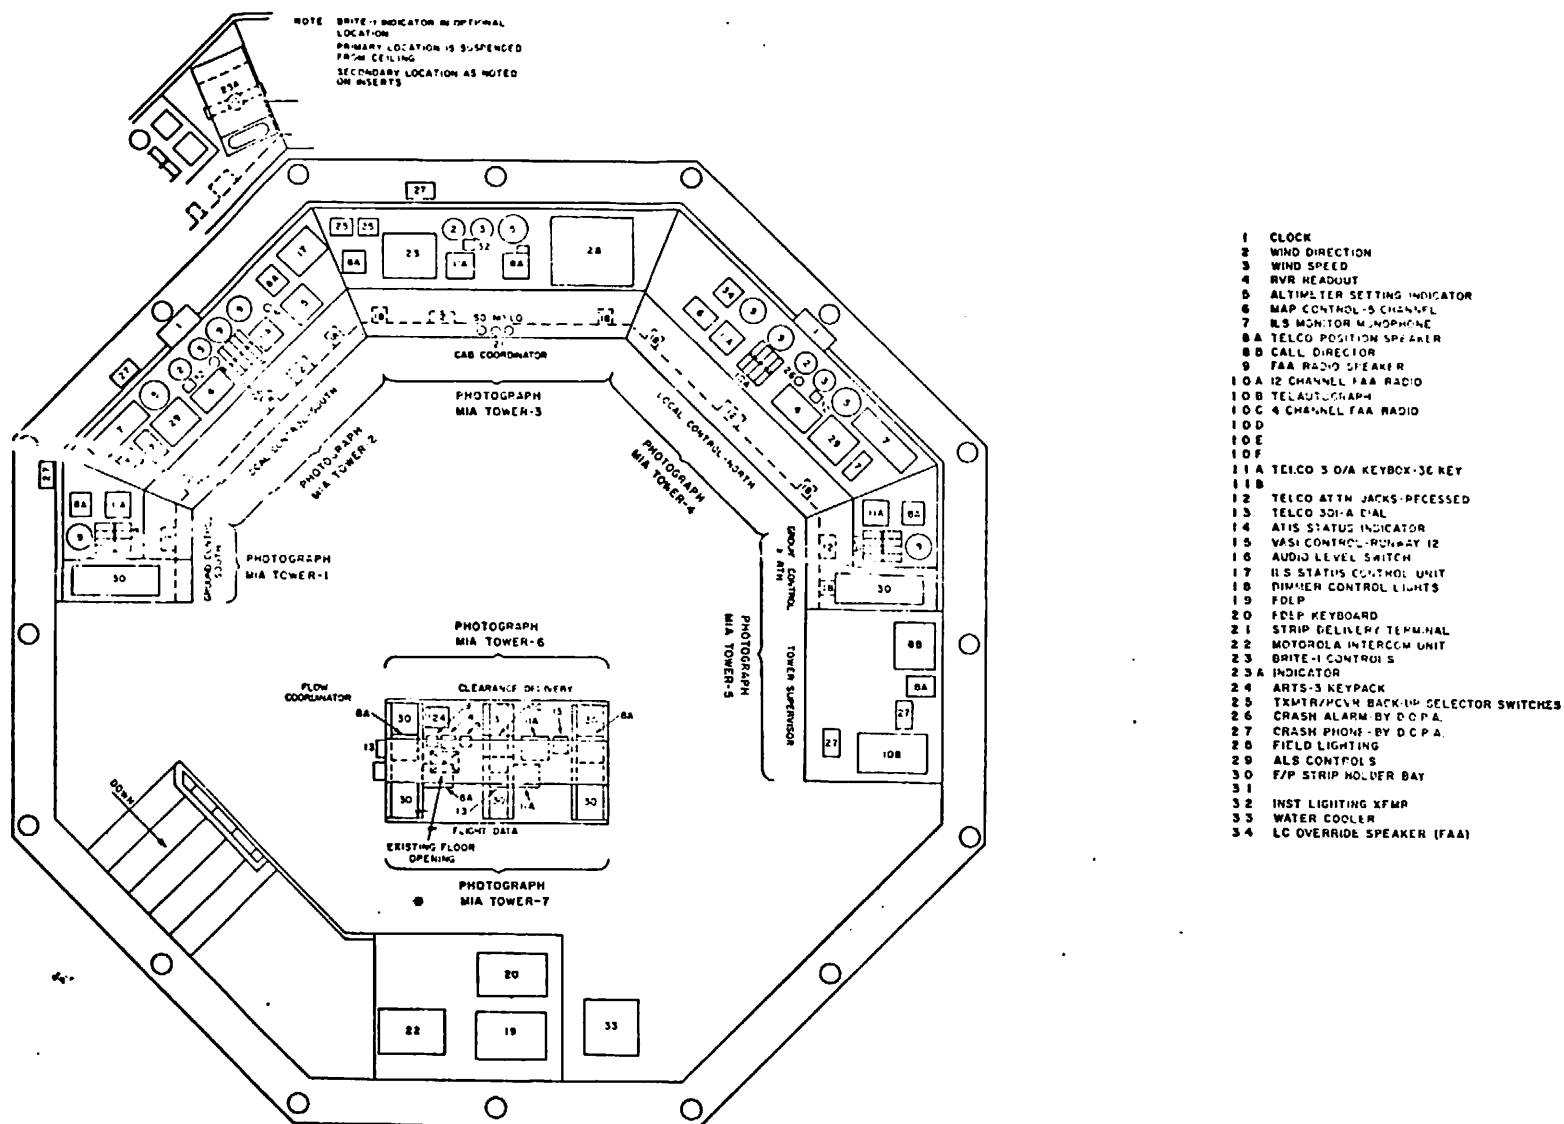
LAYOUT OF MIAMI TOWER
